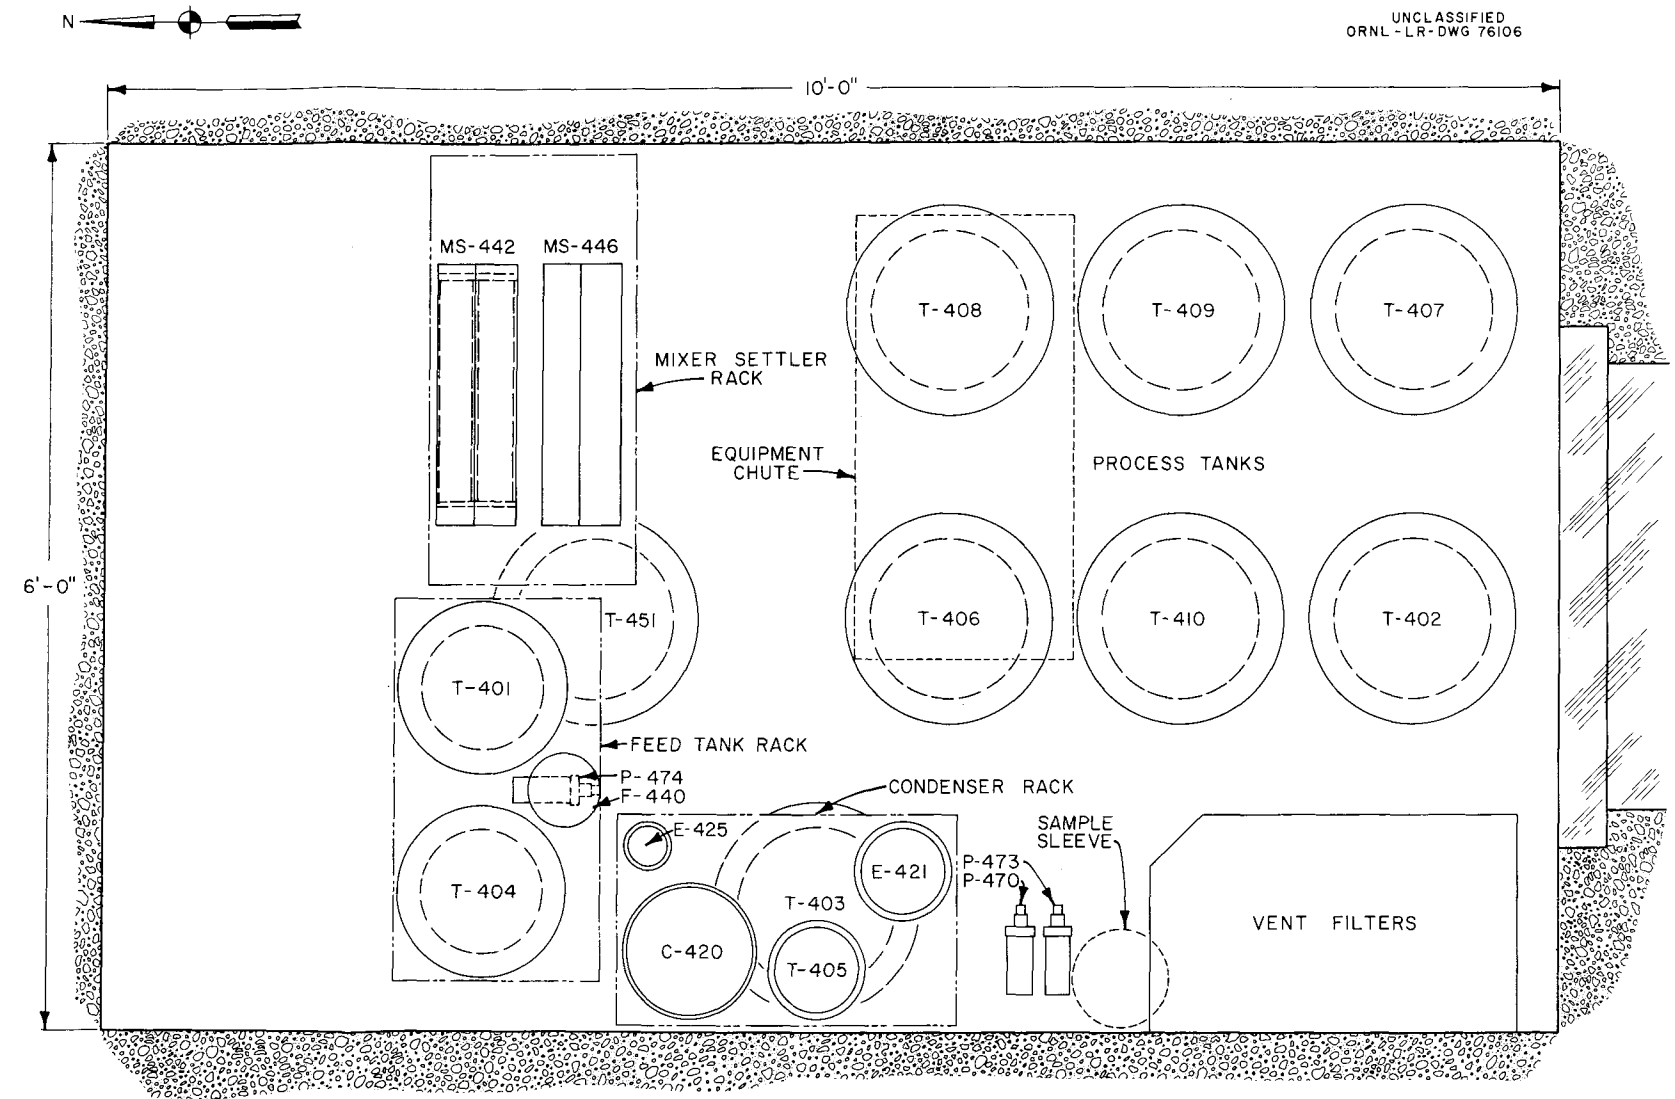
Arrangement of Equipment in Cell 4, Plan View.
